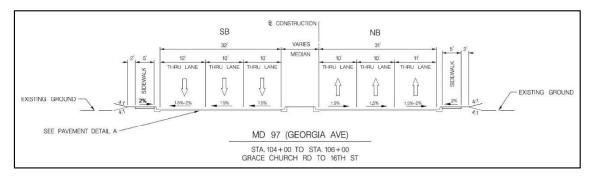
Existing/Proposed Typical Cross Section – South of 16th Street
